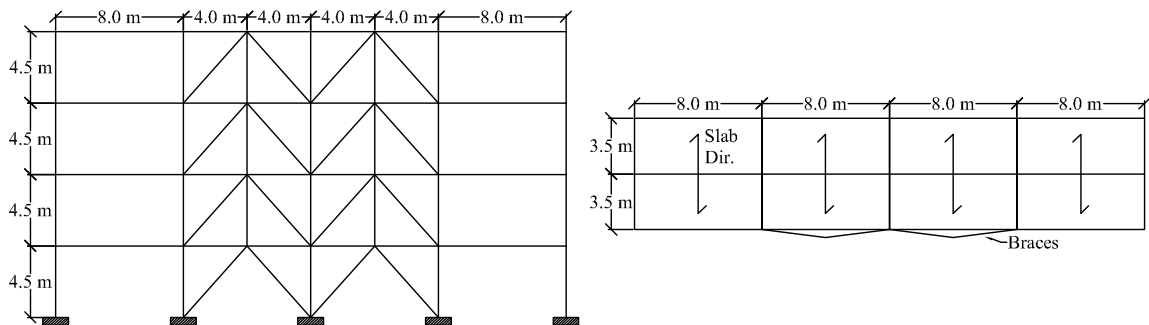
Left: Elevation view of SCBF. Right: Plan view of modeled bay.
